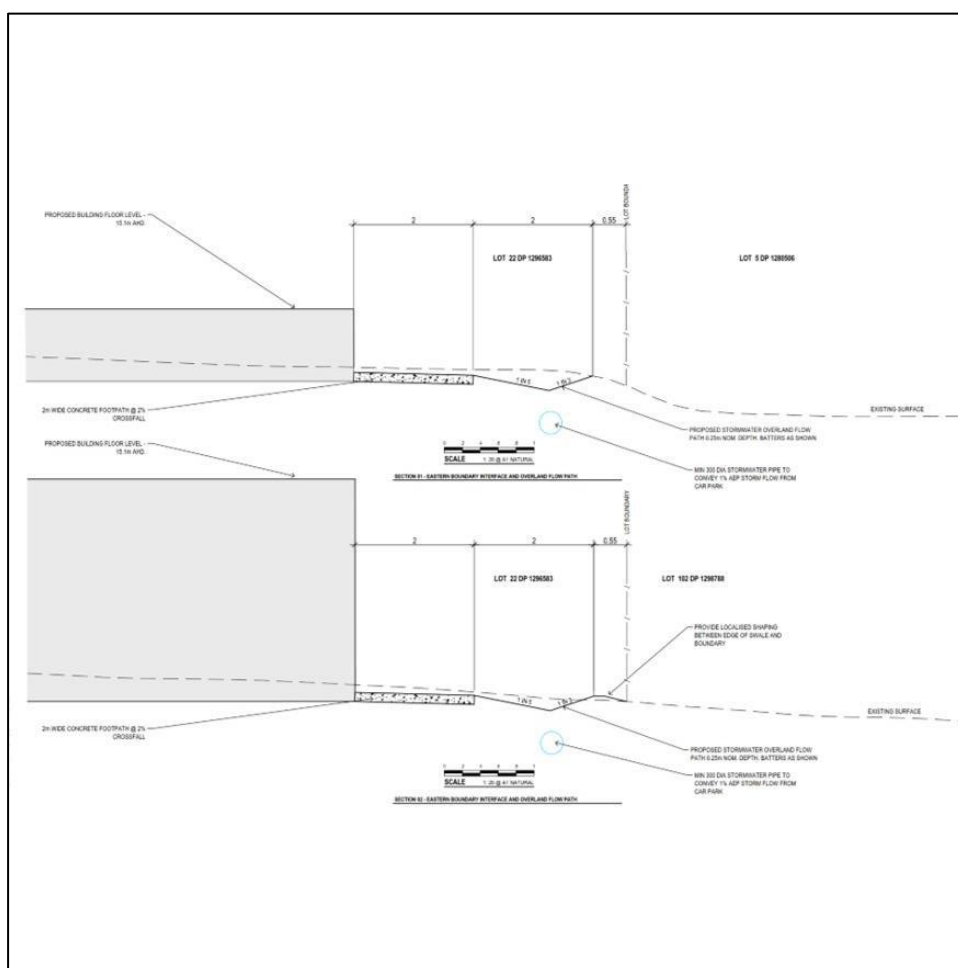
Excerpt from Figure 12 from the Stormwater Management Plan
